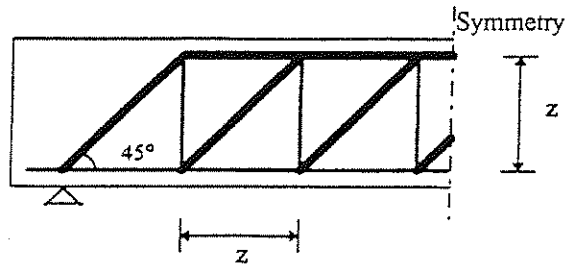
Truss action in a simply supported reinforced concrete beam by Morsch.
